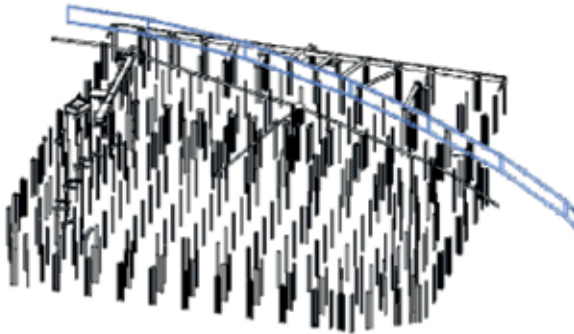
Below ground obstruction. The IAW design team modelled the buried below ground wall to improve the coordination of the finished design
